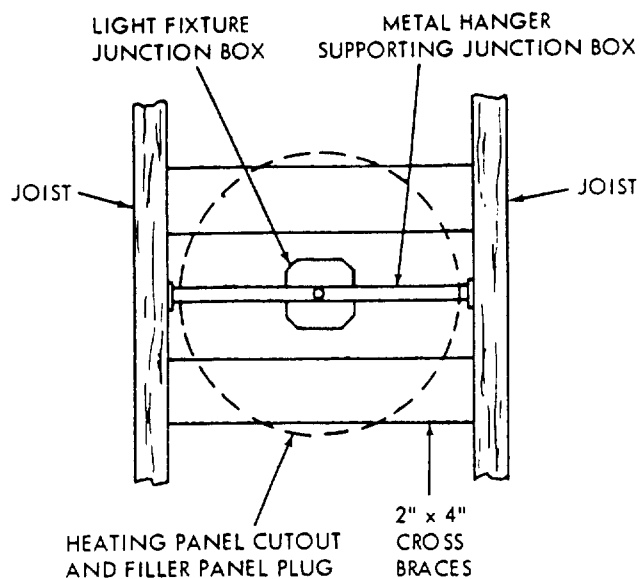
Typical Cross-Bracing for a Heating Panel Cutout
